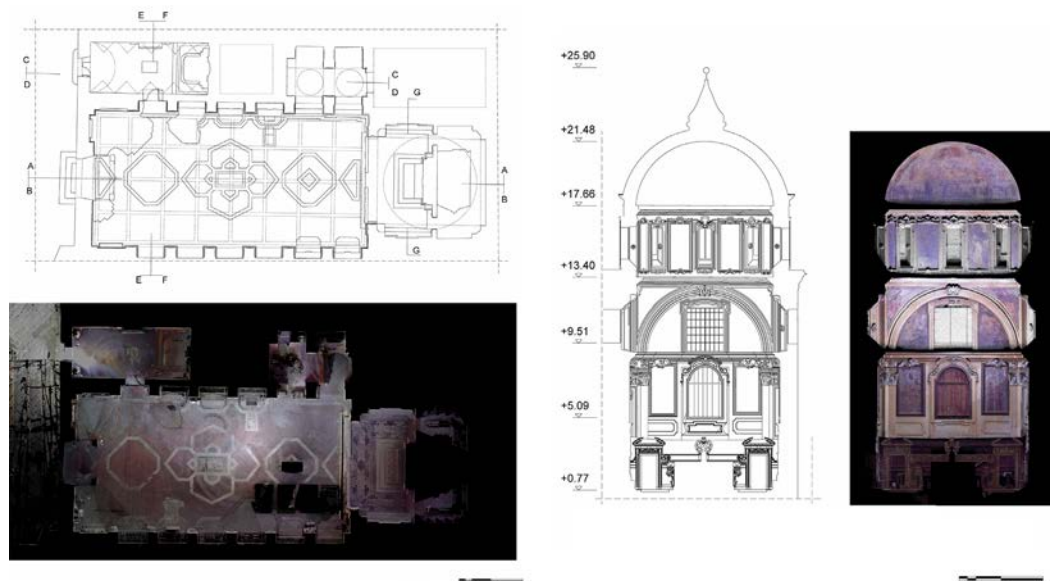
Plan of the church of Santa Maria del Popolo; section G-G.
